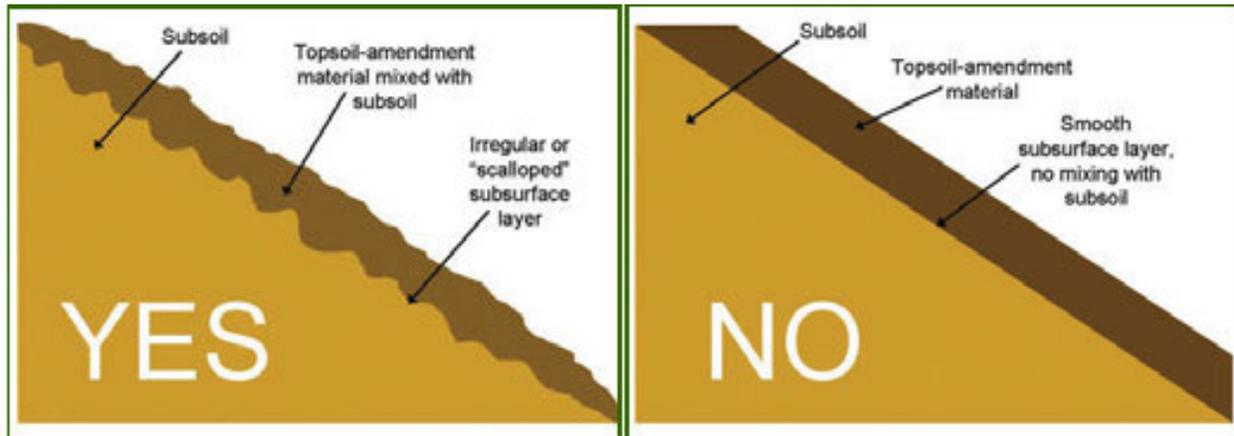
Topsoil amendment applied and mixed with subsoil, creating a scalloped subsurface layer (left). Typical topsoil amendment application without mixing with subsoil (right). Source: Watershed Management Guidebook (Drake & Hogan, 2013).¹
